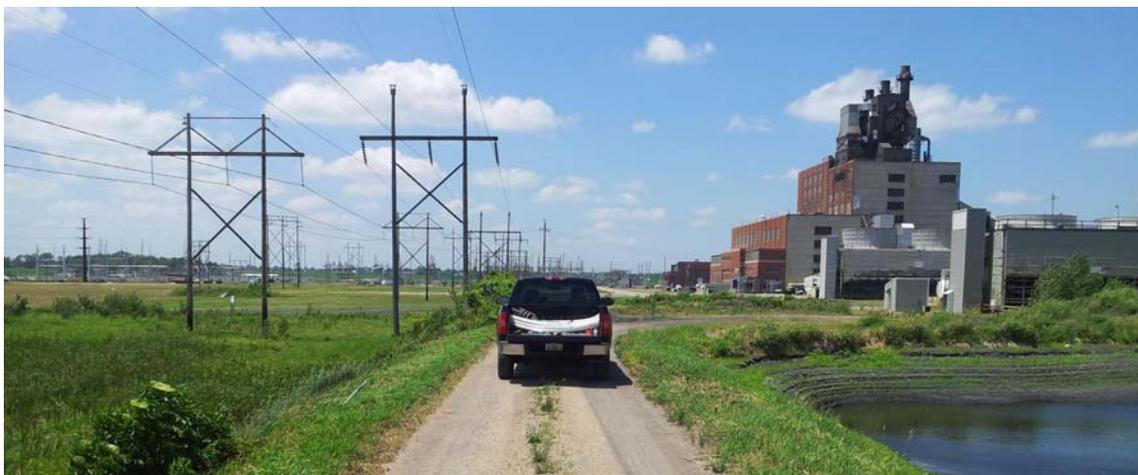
South western corner of the Main Ash Pond looking west. (Aether 6/19/2012)
